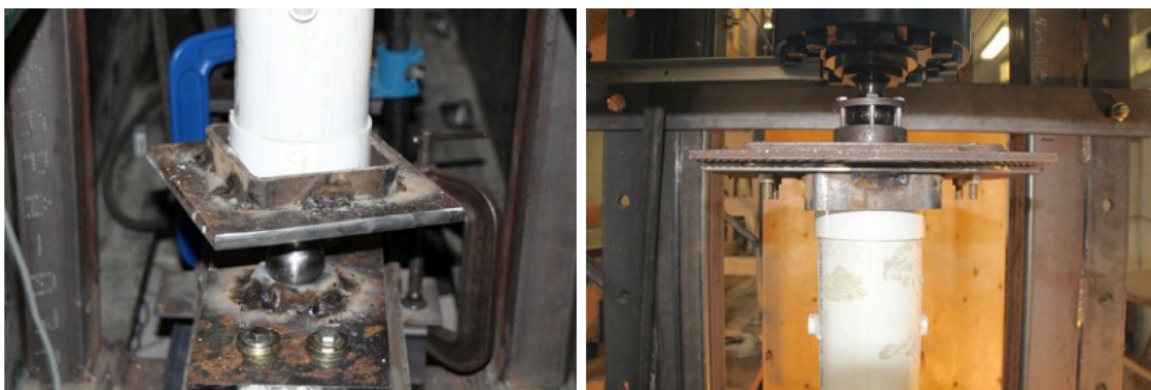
CFPT Axial Test Bottom (L) & Top (R) Hinge Connections
